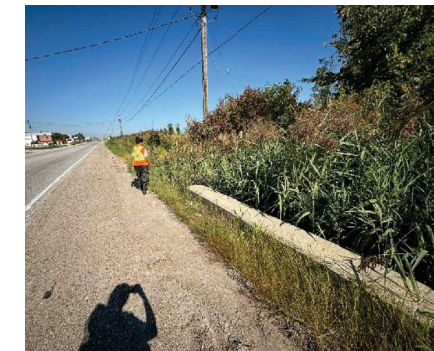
Facing northwest at Crossing 3, from the north side of County Road 46.
